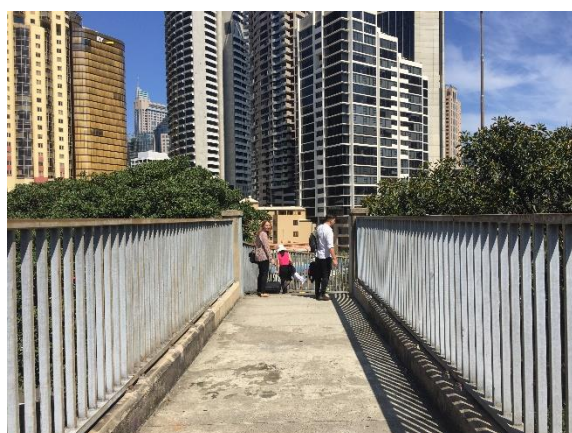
Looking southwest along existing pedestrian/cycle bridge over Cahill Expressway towards Sydney CBD.
